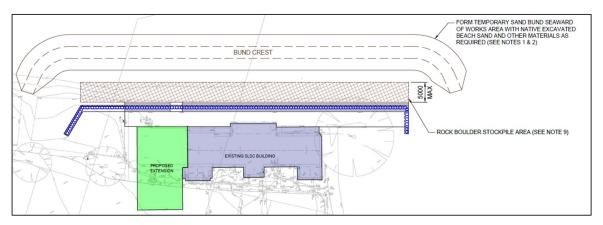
Temporary works (source: Coastal Protection Works Plan Drawing No. S05)
